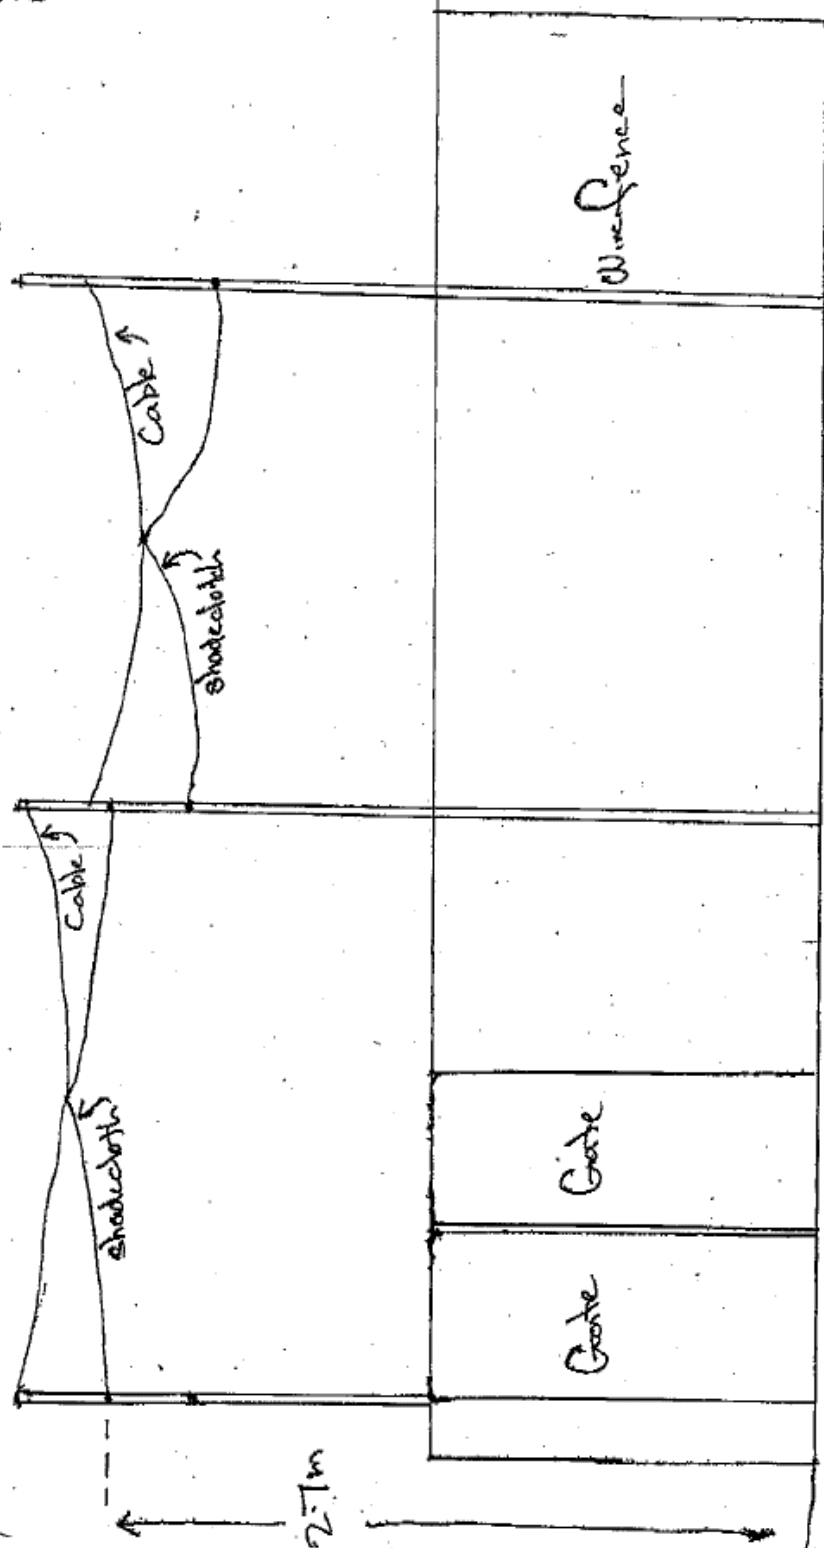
SHADE SAILS FRONT ELEVATION VIEW
